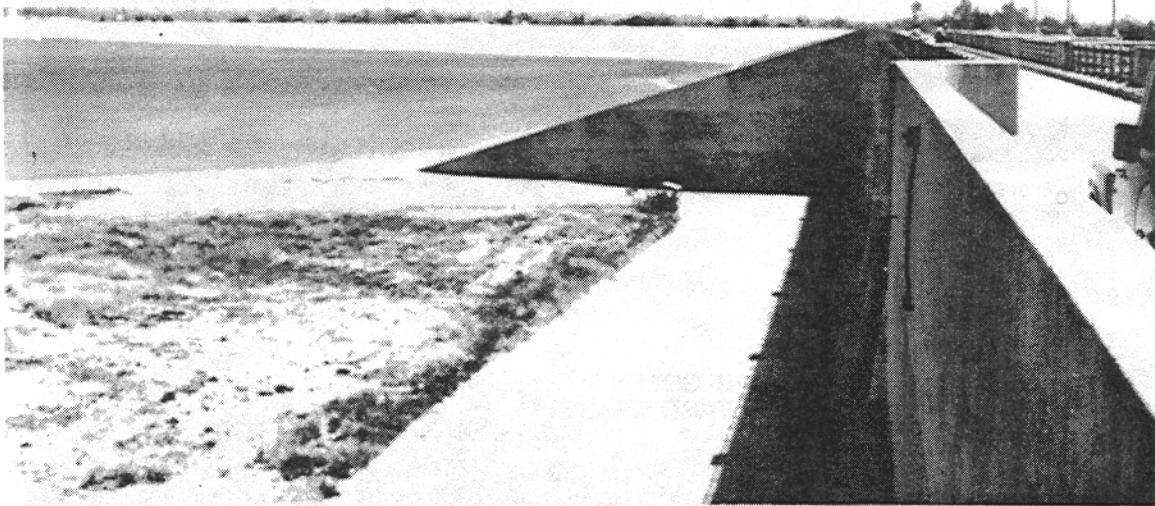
Upstream Face of Dam Northeast of Spillway (view toward northeast, from spillway bridge).
